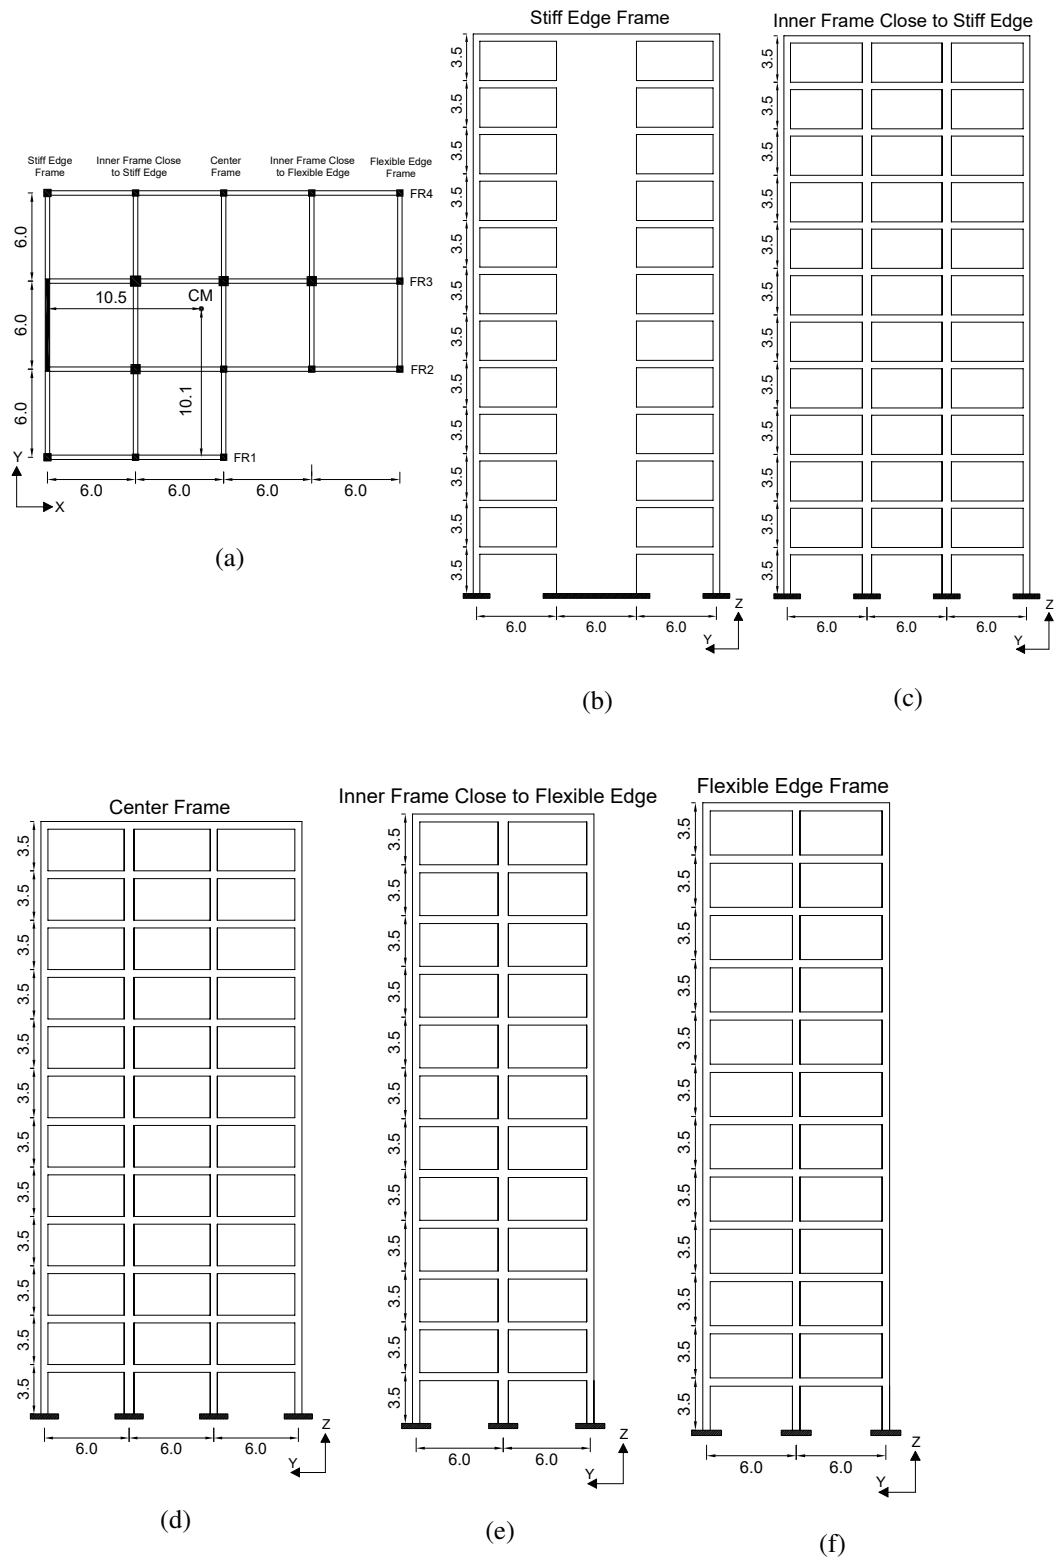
Typical floor plan of the twelve story asymmetric structure and elevation view of the frames in the direction of analysis. Center of mass (CM) is marked on the plan. (Units in meters)
